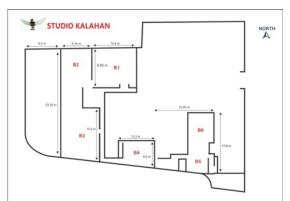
Second-Floor plan (Documentation: Agni Saraswati-Studio Kalahan)
